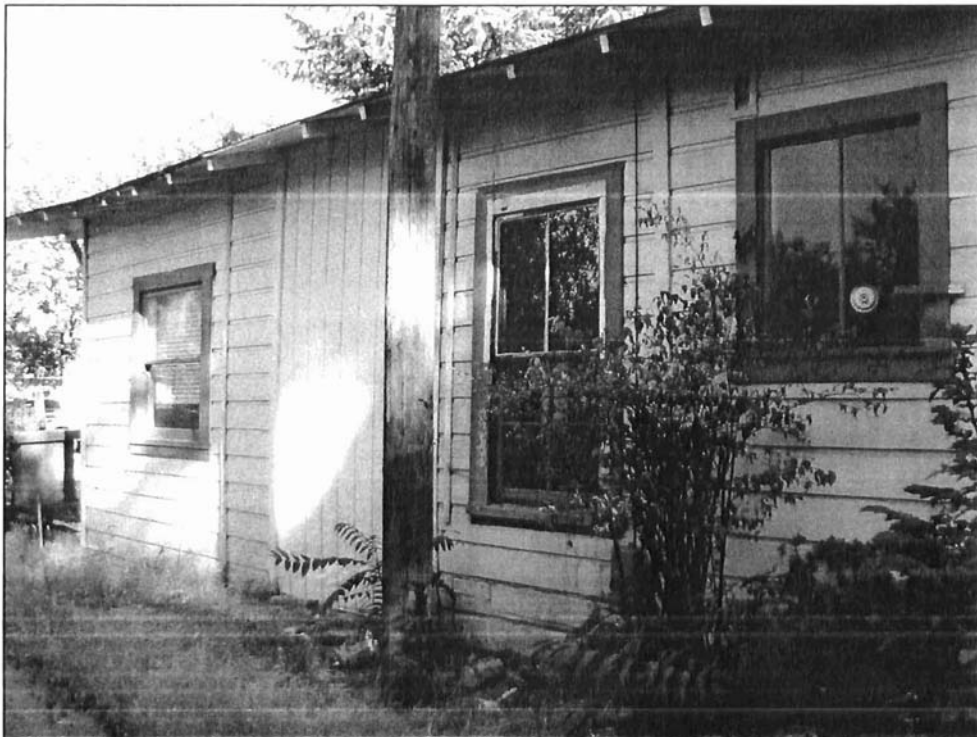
East end of north elevation at 721 Pine Street, showing the location of a former chimney.
